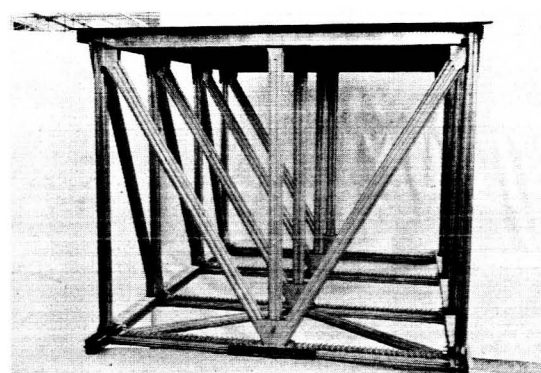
FOIL GAGE STRUCTURAL SPECIMEN
